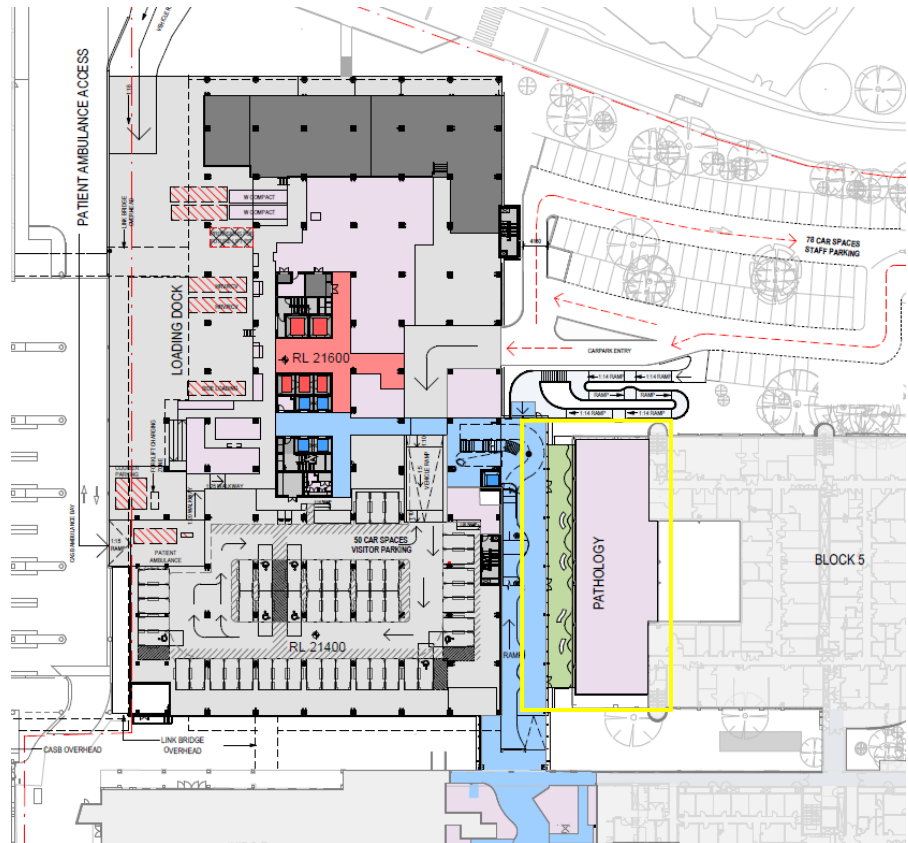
Level 2 floor plan for the PSB and Block 5.
